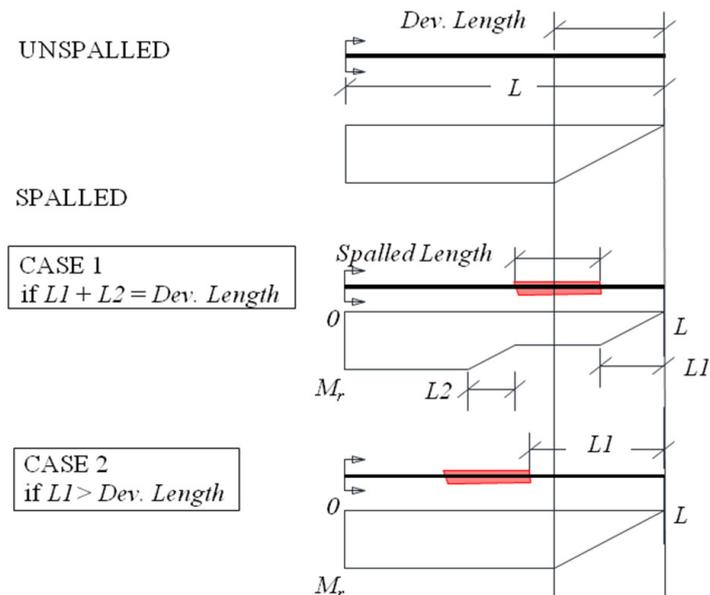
Moment resistance with unspalled and spalled bars
